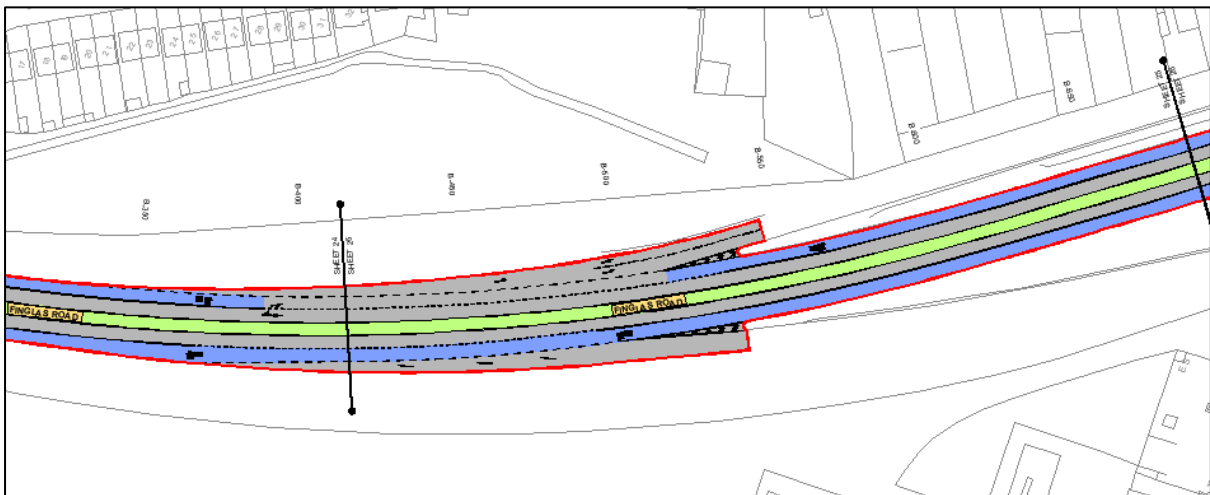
Extract from General Arrangement Drawing Sheet 24
